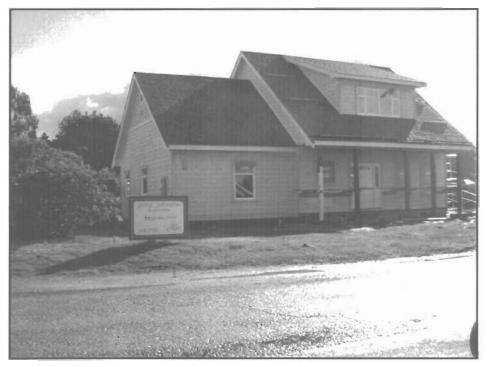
2707 Daffodil Avenue. This single family residence is located across the street from the one seen above (Photo 15) and next door to 2721 Daffodil (Photo 14).
